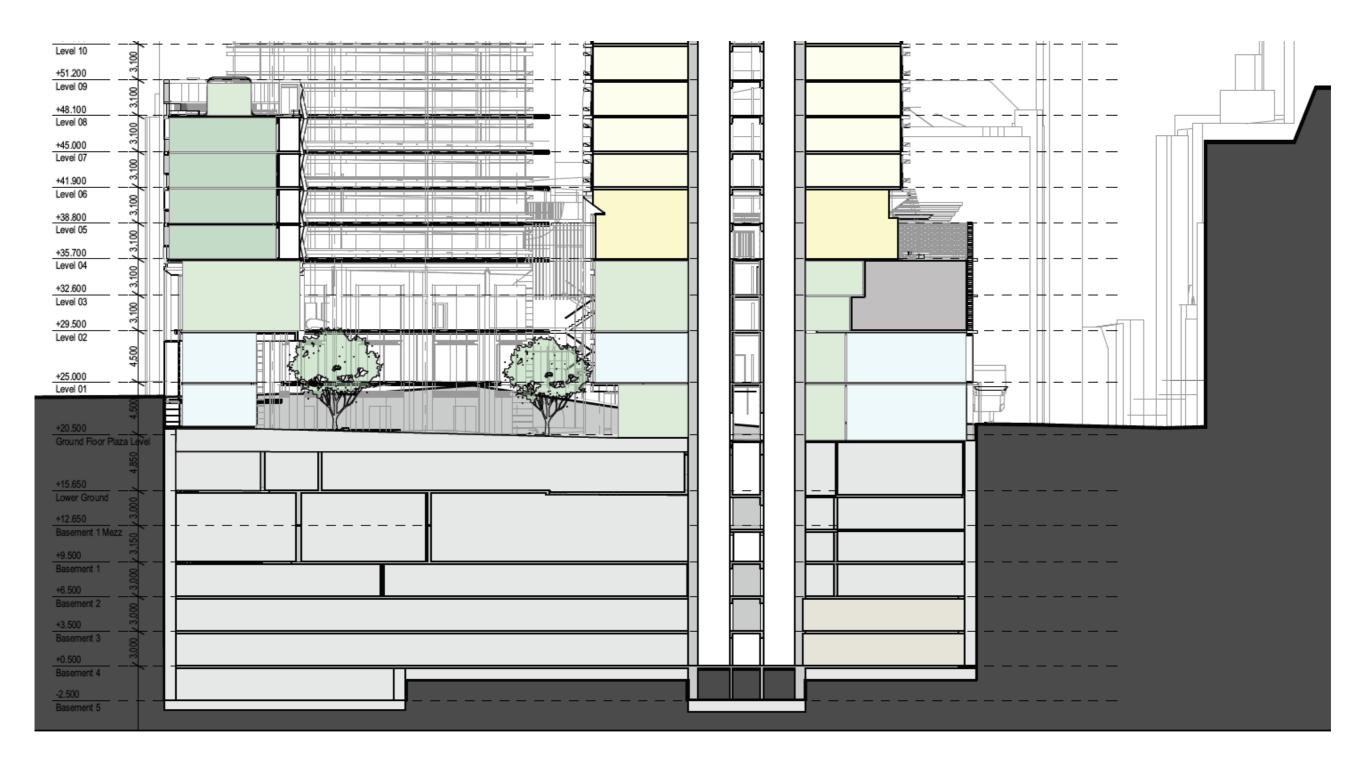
Snapshot of indicative section plan showing proposed RL's for lower building levels and basement levels. Francis-Jones Morehen Thorp Pty Ltd, March 2020, Drawing no. 4000, Revision 08.
